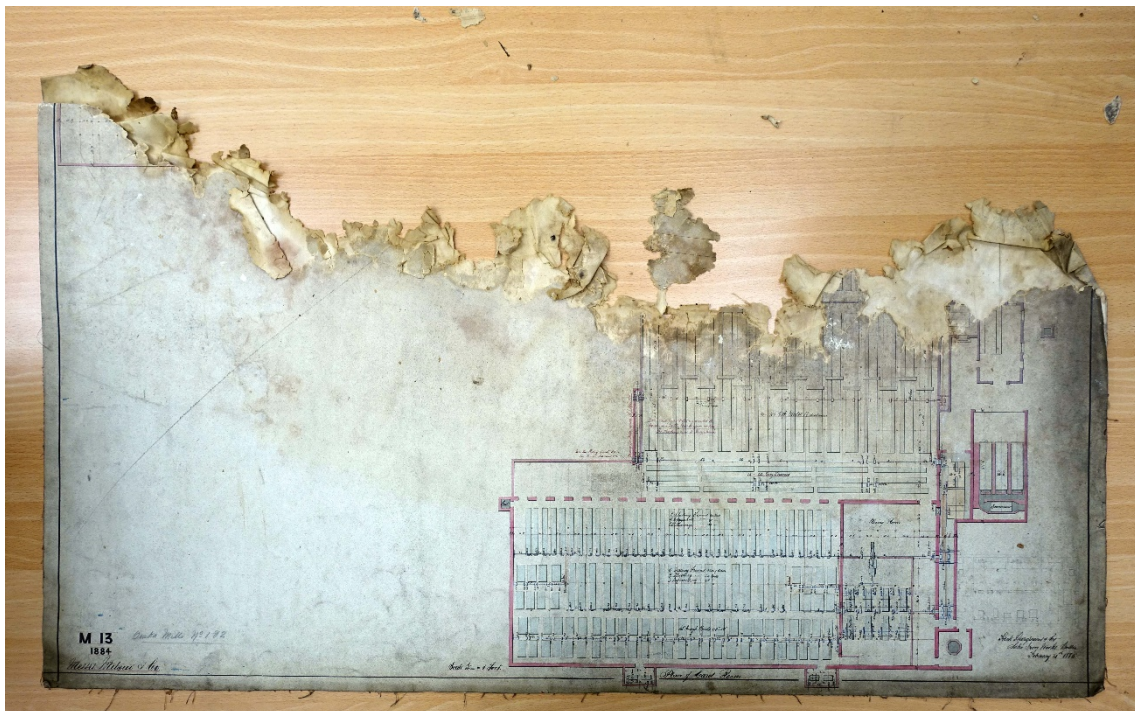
Machinery layout plan, Mill No. 2 at Osaka Bōseki [1885/16]
